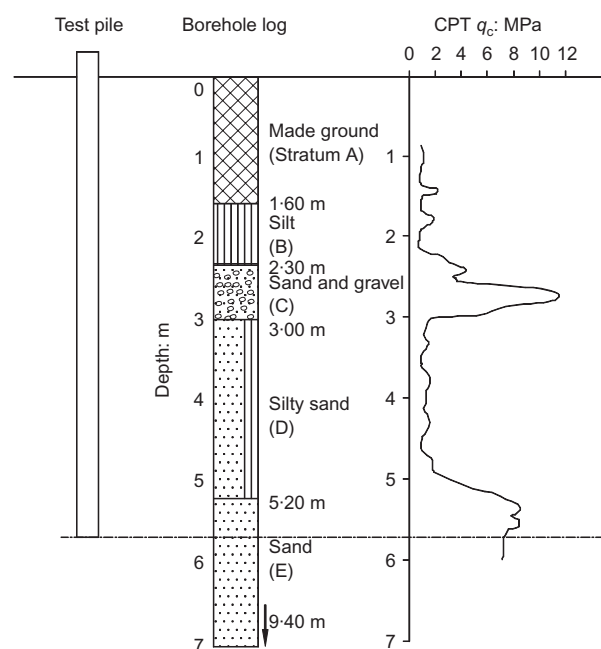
Ground conditions at test site in Takasu, Kochi, Japan
